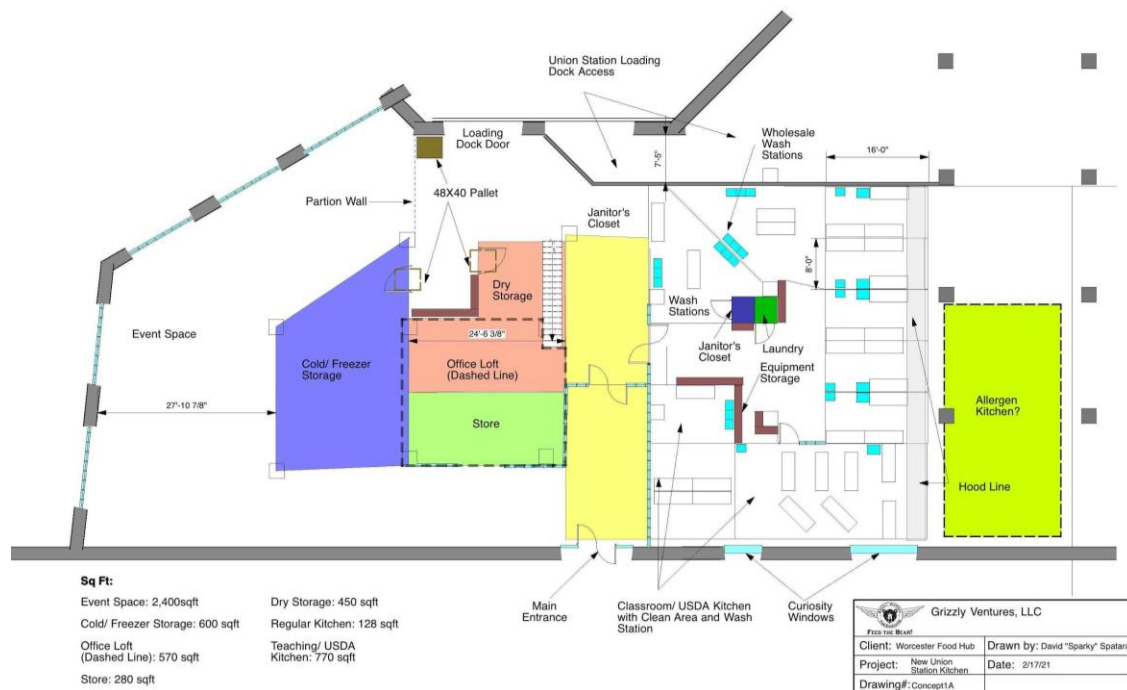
Layout of Worcester Food Hub’s new facility at Union Station.
